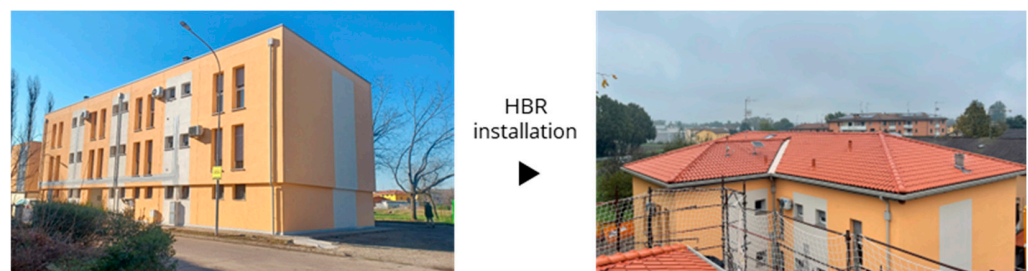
Demonstrator building retrofit with HEROTILE-based roof.
